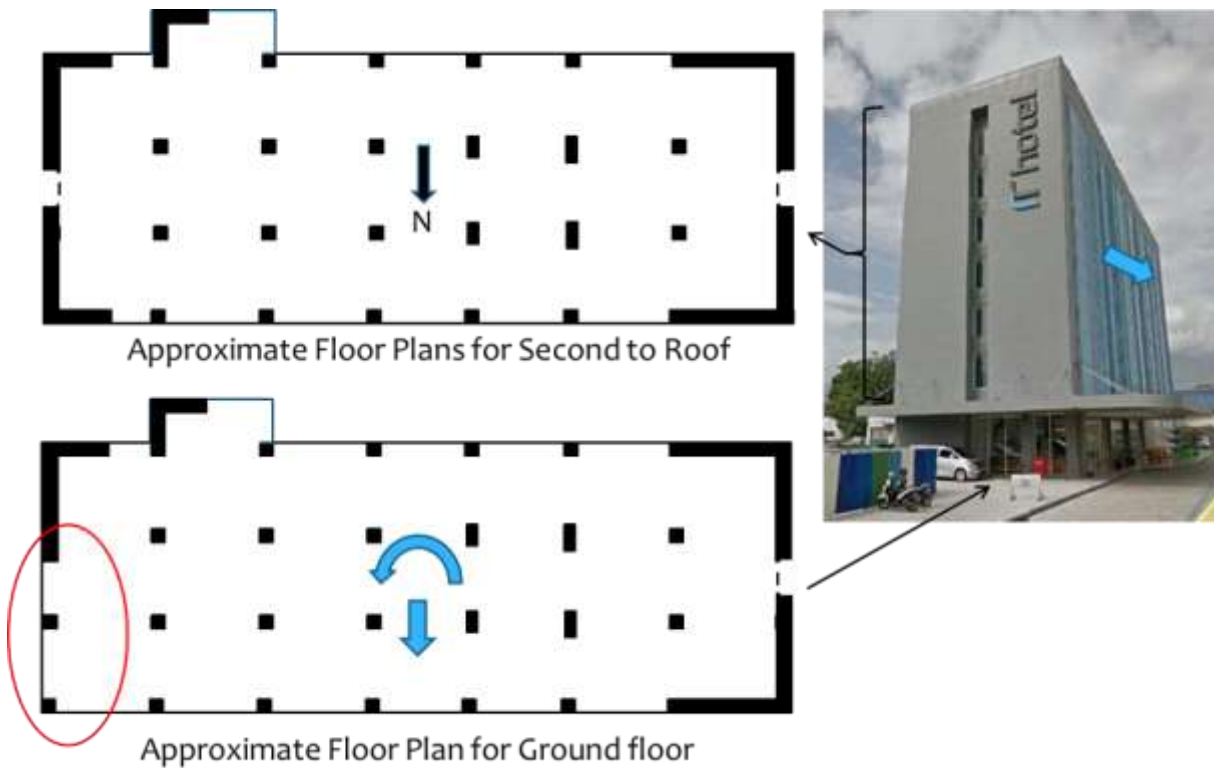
Approximate floor plans and presumed failure mode for Roa Roa Hotel.
